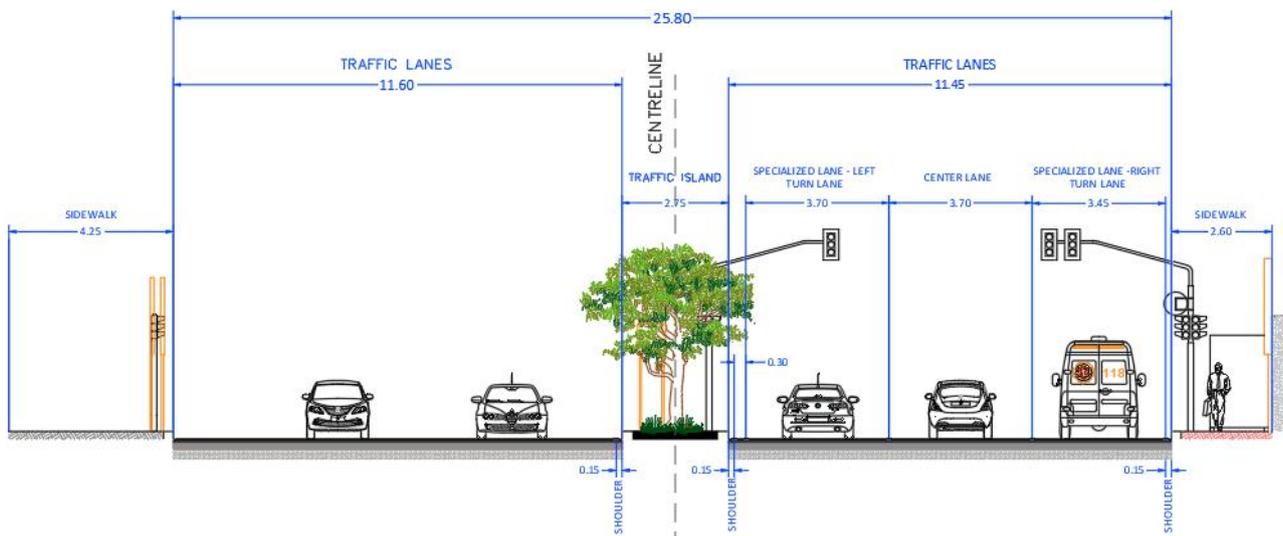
Cross section, intersection I - Via Cotugno.
